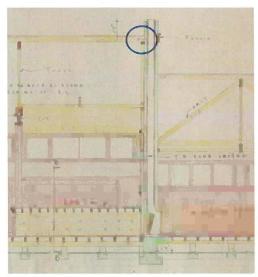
Original detail of the chimney structure, proposed tie back circled
